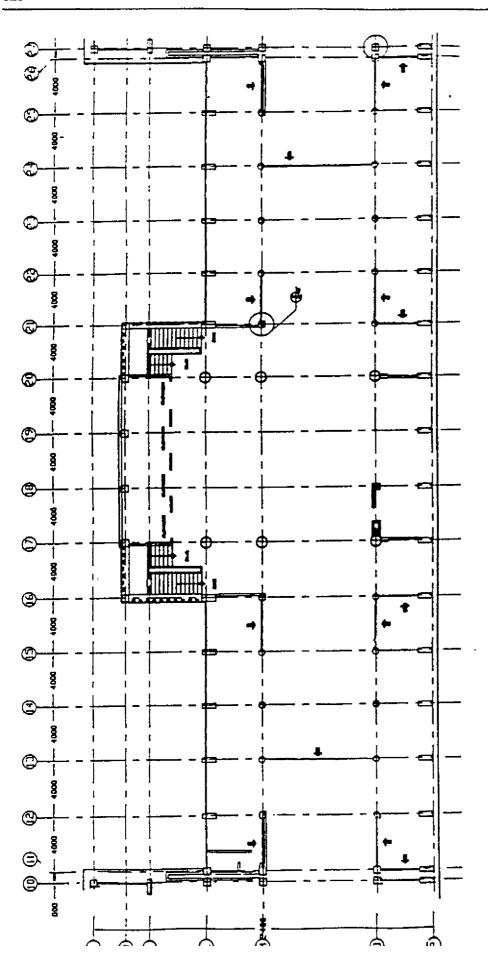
Plan Showing Locations of ADAS Bays in IMSS Reforma Building 1 (Lower Level-to-Roof)
